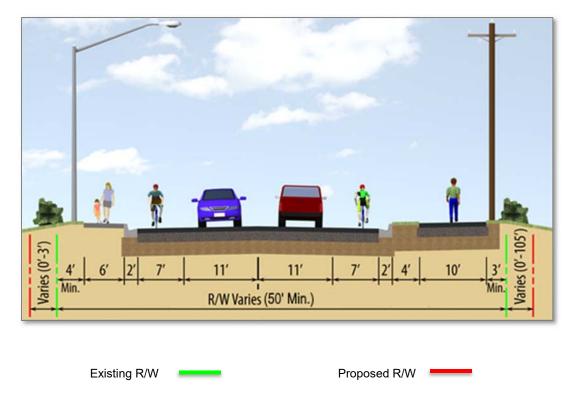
BUILD ALTERNATIVE 2 - ROADWAY TYPICAL SECTION
